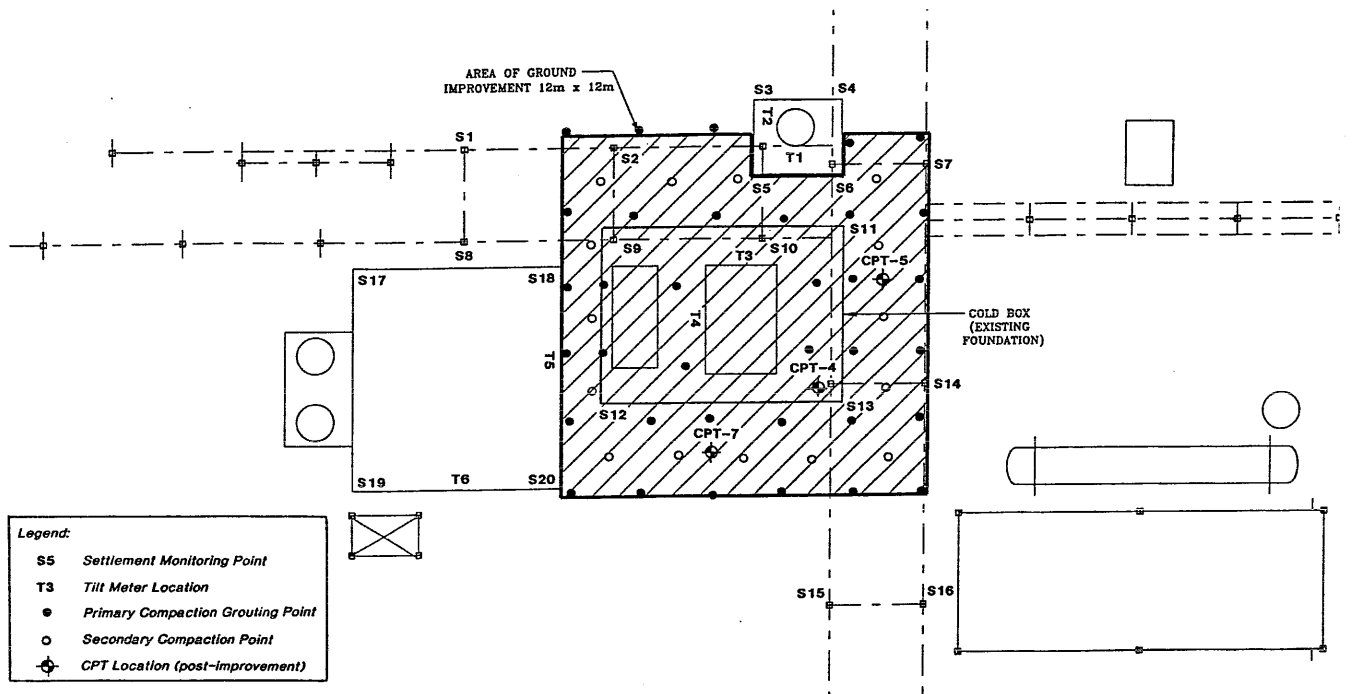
Area of Ground Improvement and Monitoring Points for Compaction Grouting
